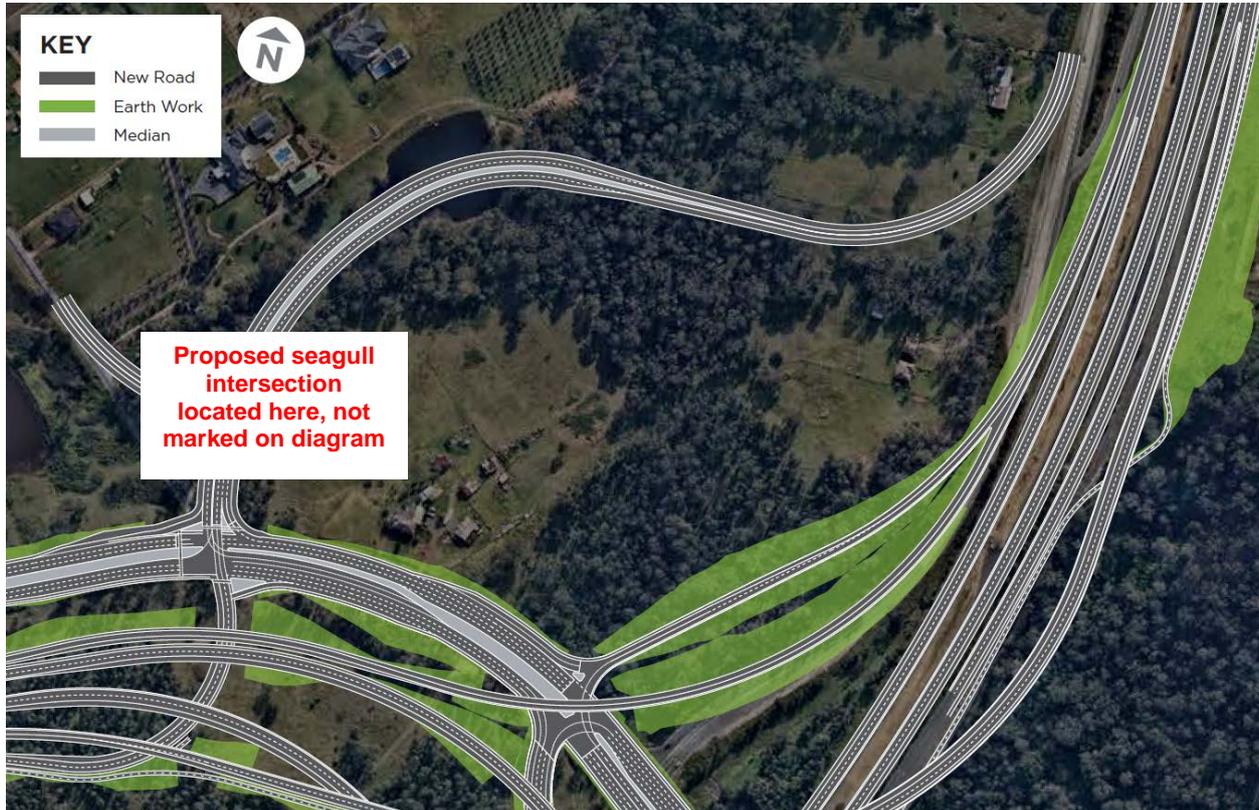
Option B – Seagull intersection at Cecil Road and Wallgrove Road and the removal of the roundabout
